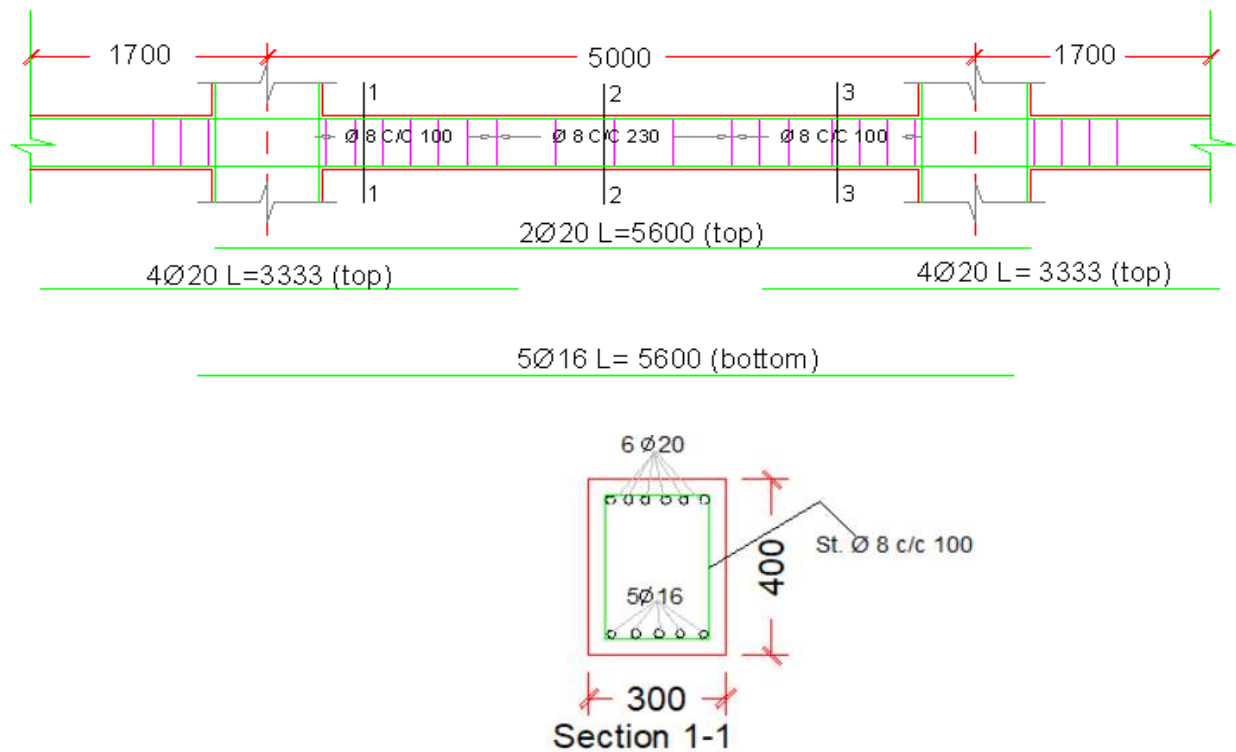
Sample detailing of a beam in DCM 10 favorable model
